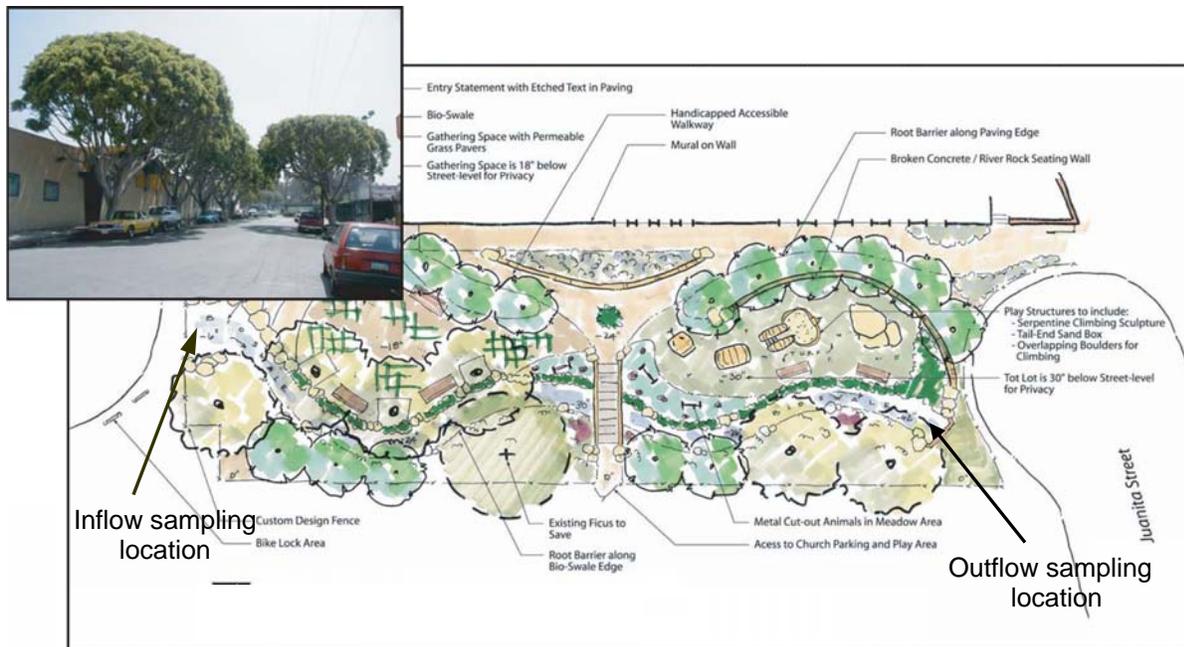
Bimini Slough Ecology Park – Before (left): city street in Koreatown with underground storm drain. After (right) storm drain brought to the surface and integrated into a neighborhood park.
